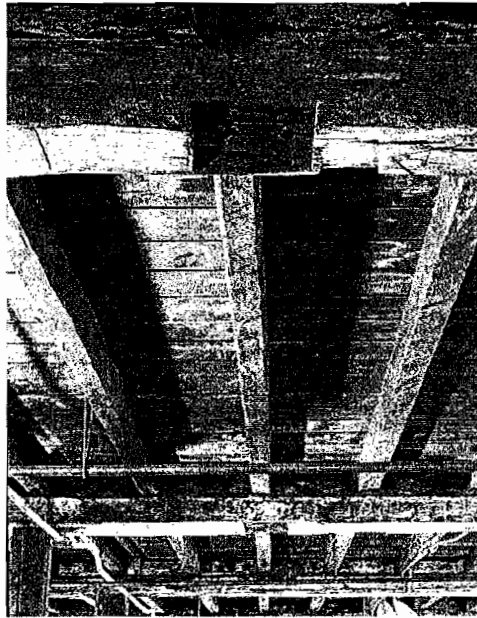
Photo of Joists. Traditional heavy timber construction, photograph shows joists between the beams in Slater Mill. Historic American Engineering Record, Slater Mill, RI-1-26
